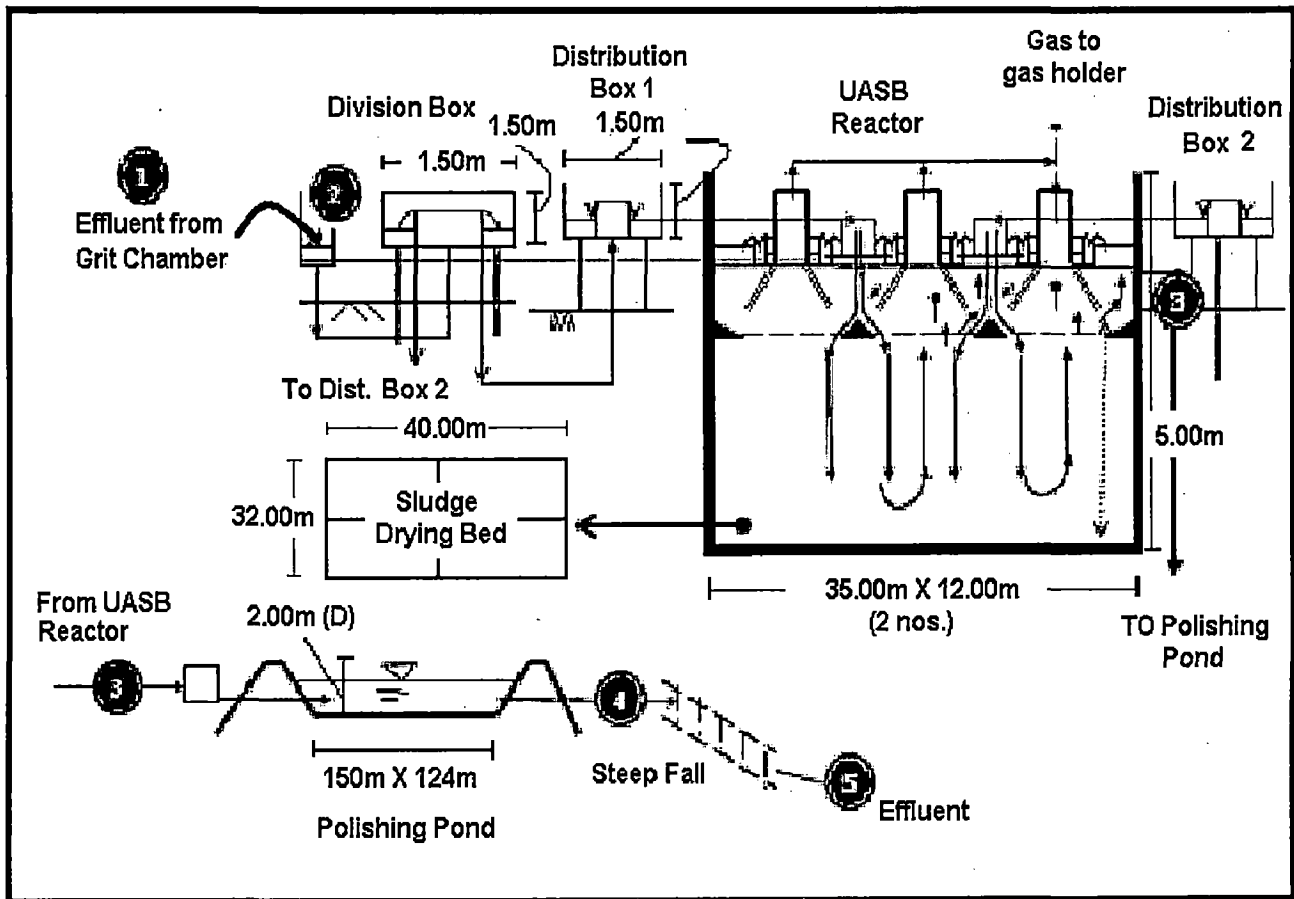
Typical layout of sectional drawing of (UASB+FPP)
